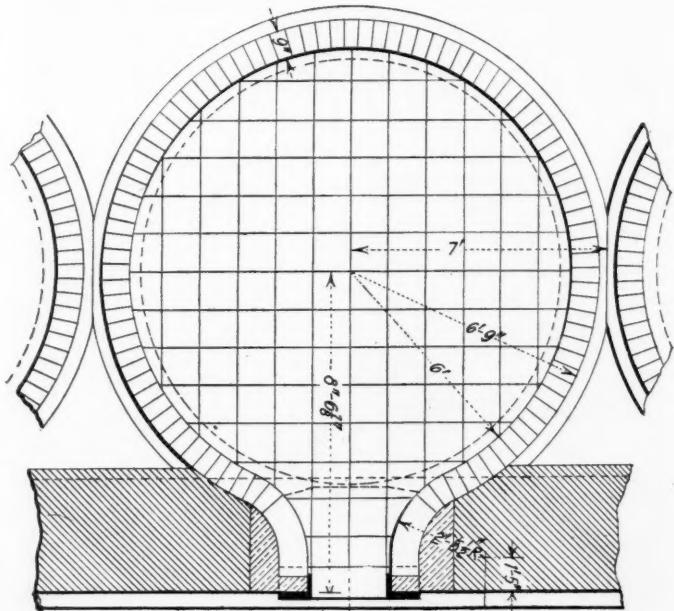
PLAN OF TYPICAL, HAND-DRAWN BEEHIVE COKE OVEN
